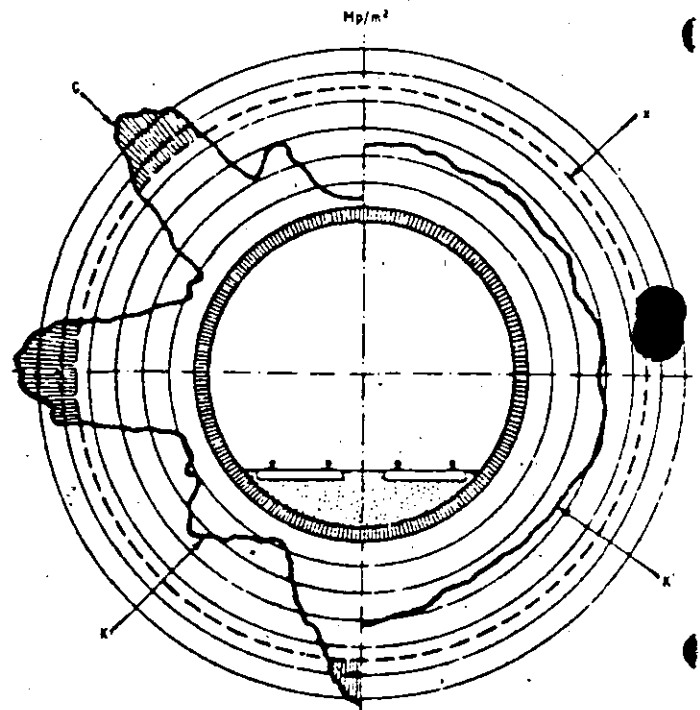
Distribution of radial pressures acting at the extrados of a lining of precast concrete elements. Left side: Pressures with backfilling by normal grout, portions G indicating places where the pressure exceeds the carrying capacity of lining x. Right side: Pressures with backfilling by special grout (after Benda)²²
